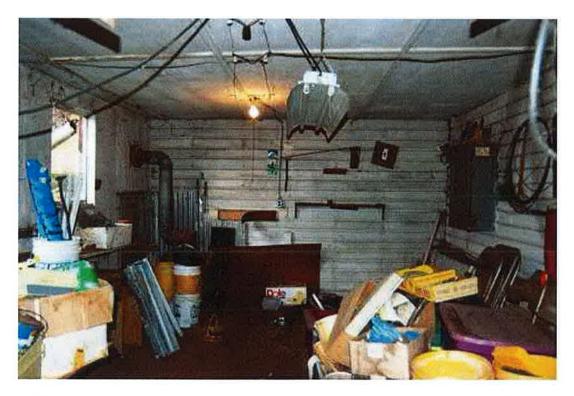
of 8: Looking east at the interior of the north side shed addition, first floor.
